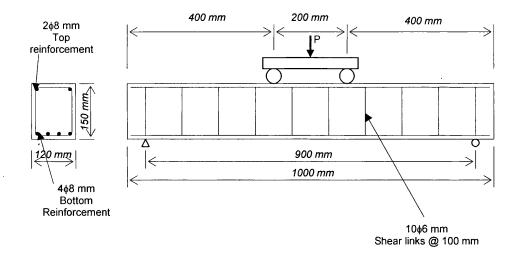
Cross sections of Reinforced Concrete Beam with arrangement of Loading
